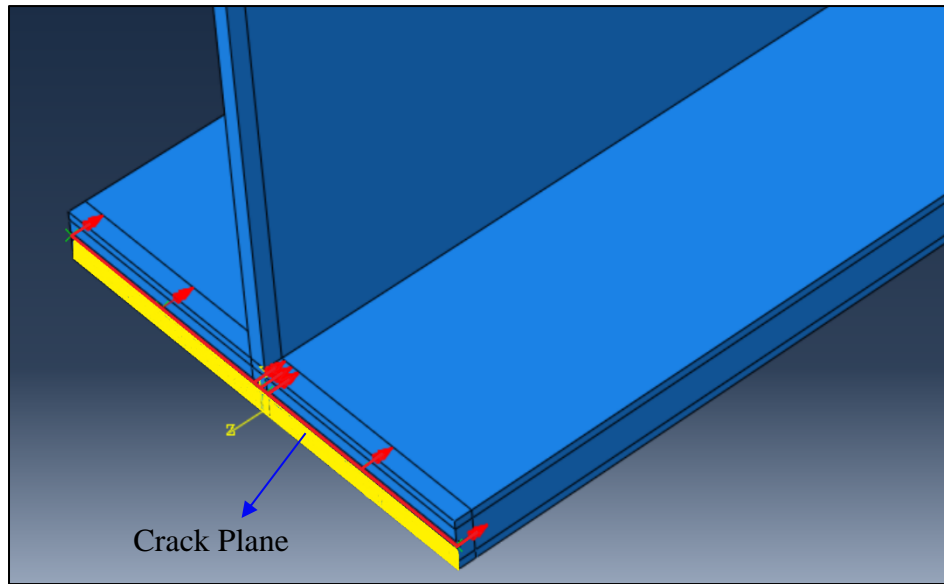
Full-width Crack Plane in the Tension Flange
